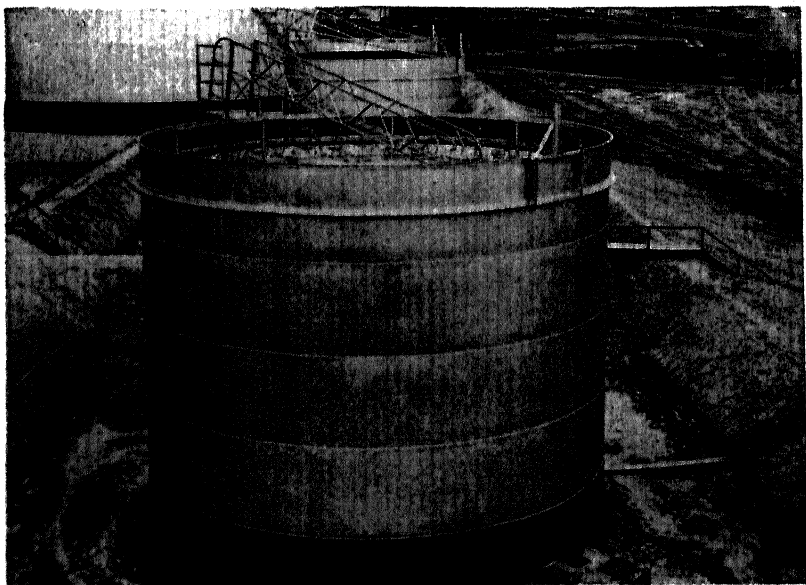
1500 bbl. and 2300 bbl. welded steel oil storage tanks with Wiggins pentoon roof.
